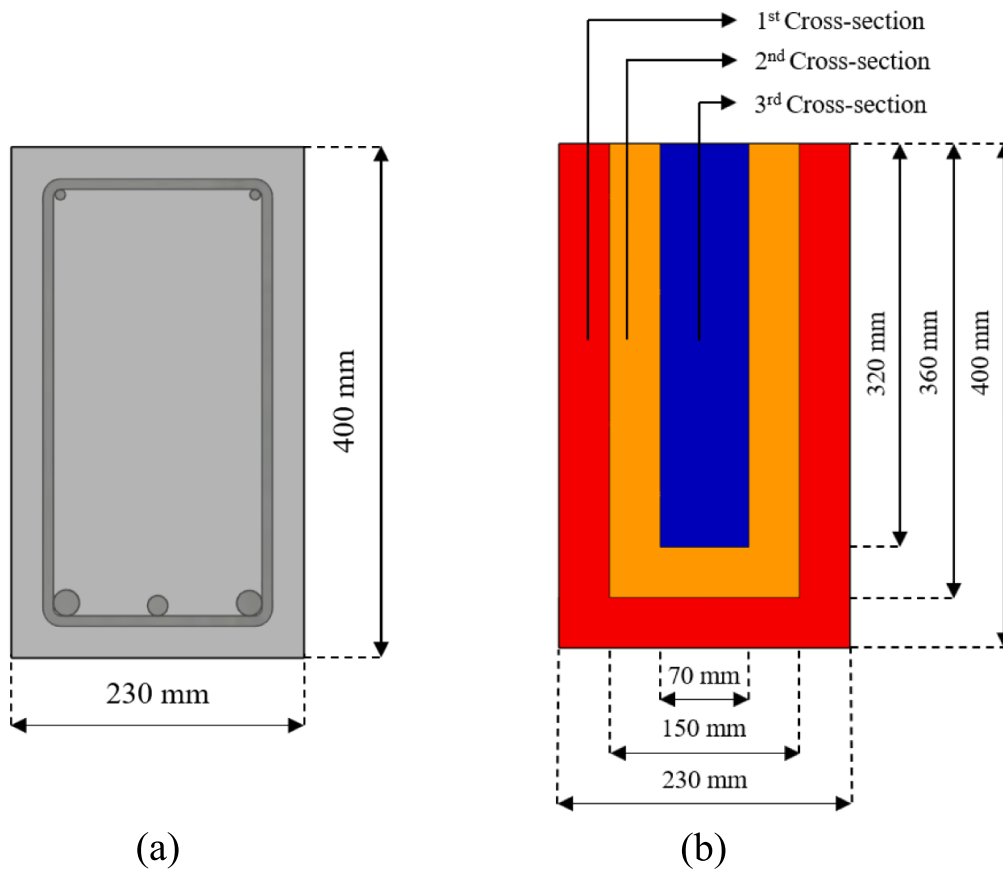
Cross section of concrete beam. a Undamaged beam. b Fire-damaged beam
